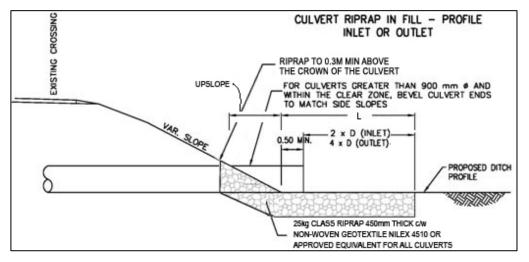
Inlet or Outlet Protection of Culvert – Profile View
